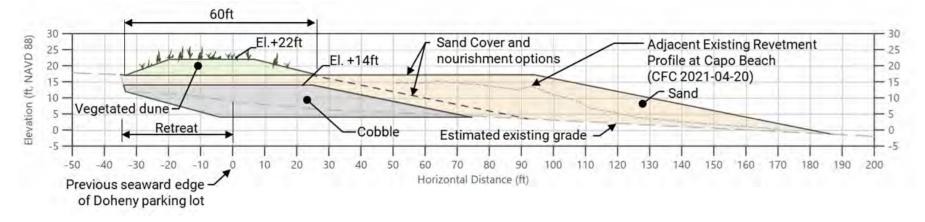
NORTH REACH COBBLE BERM AND VEGETATED SAND DUNE PILOT PROJECT - CROSS-SECTIONS
